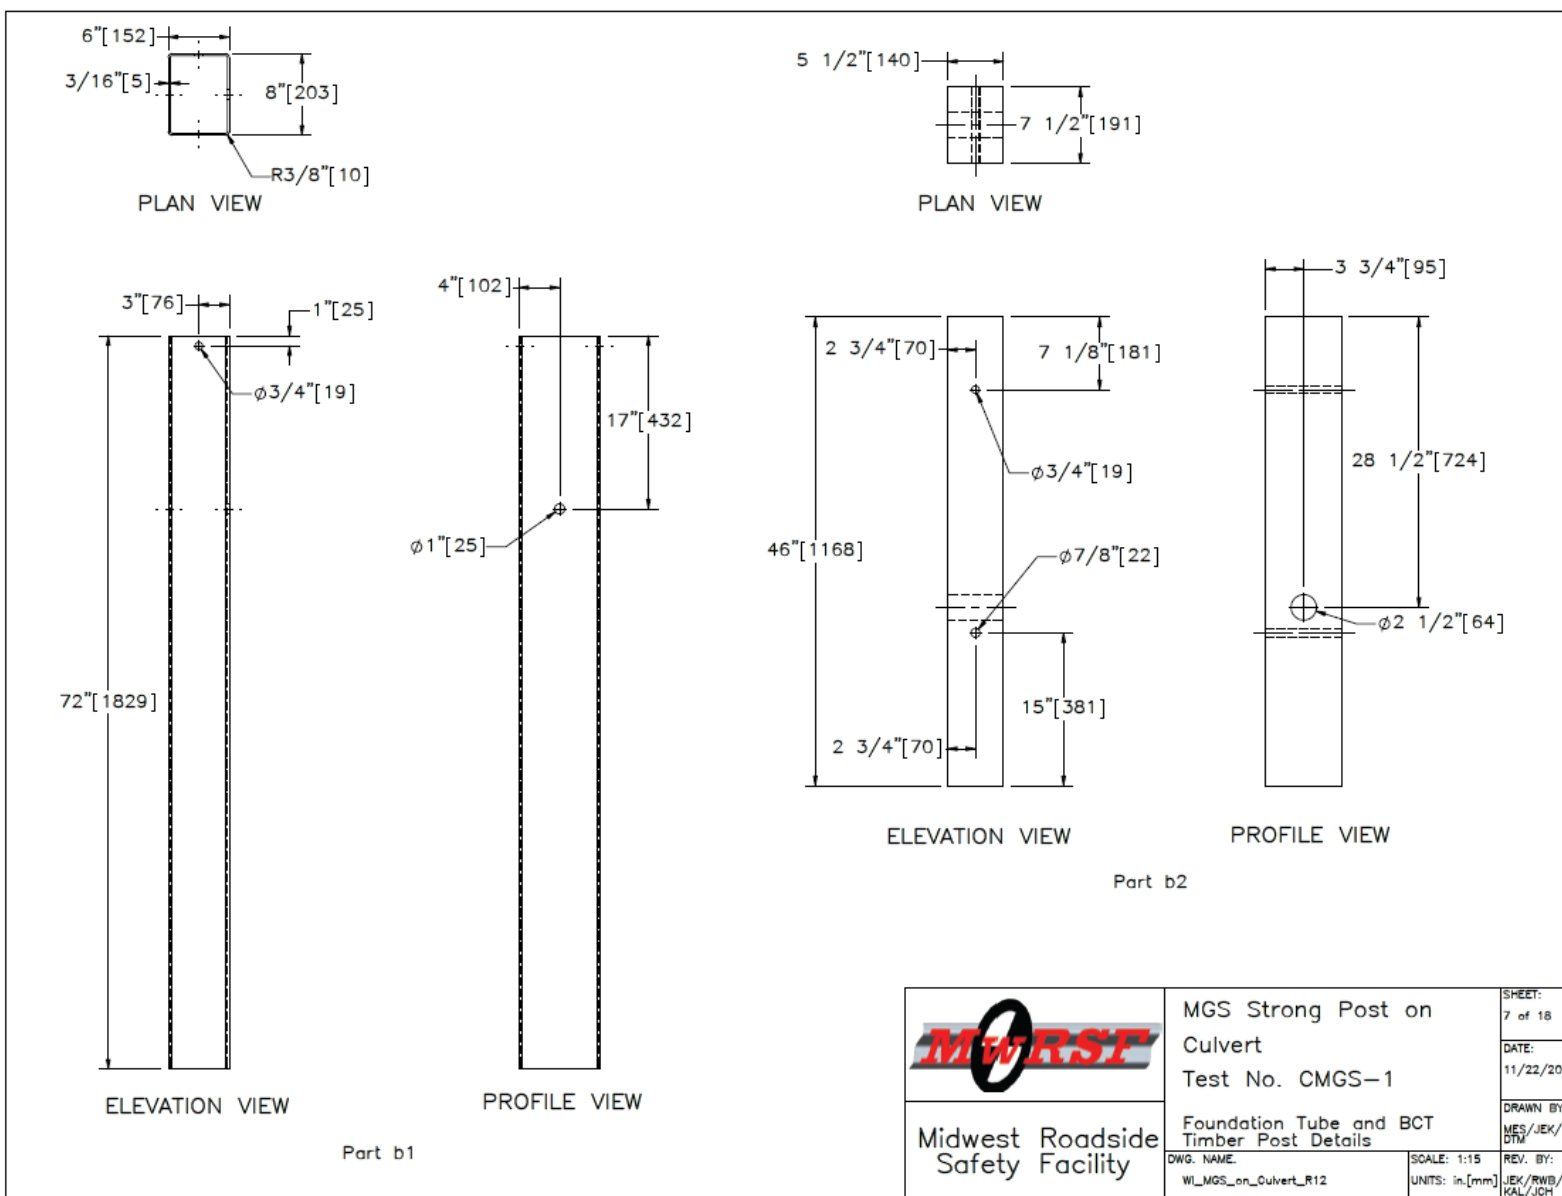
Foundation Tube and BCT Timber Post Details, Test Nos. CMGS-1 and CMGS-2
